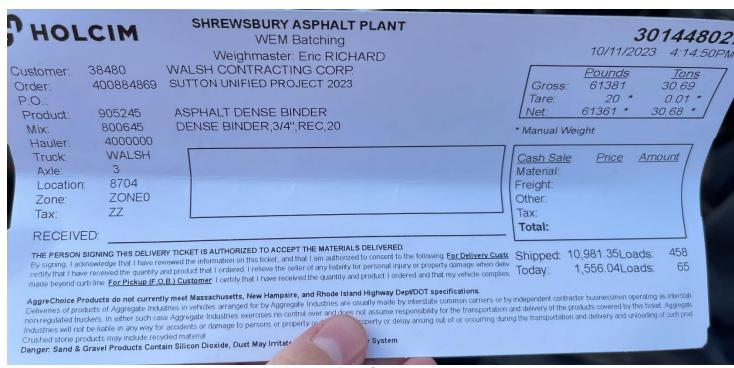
Last weigh slip from Shrewsbury Asphalt Plant.
